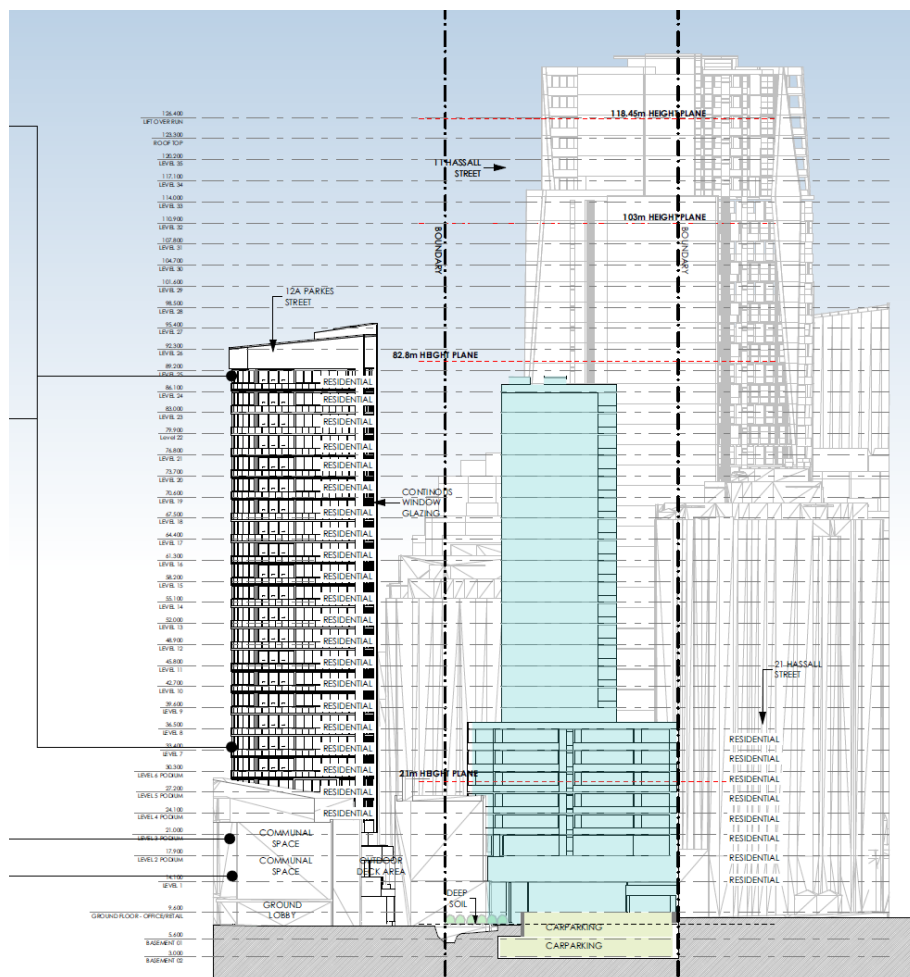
Building Achieved under Existing Height Controls (Source: PTI Architecture on behalf of applicant)
